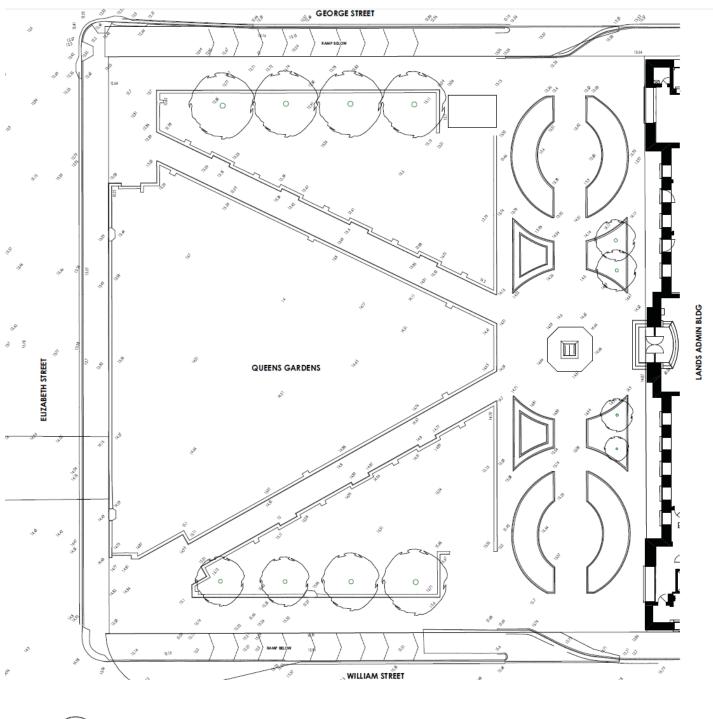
Queen's Gardens, street level layout Source: ml design 2016
